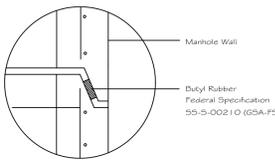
DETAIL OF PRECAST CONCRETE MANHOLE - CONE SECTION
